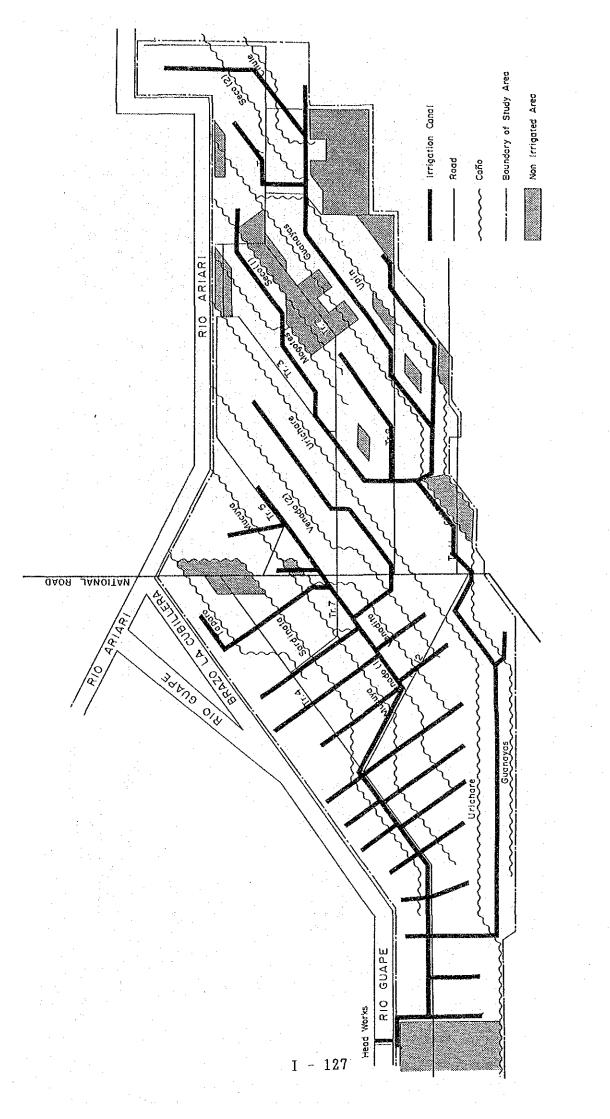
IRRIGATION CANAL SYSTEM PLAN II
